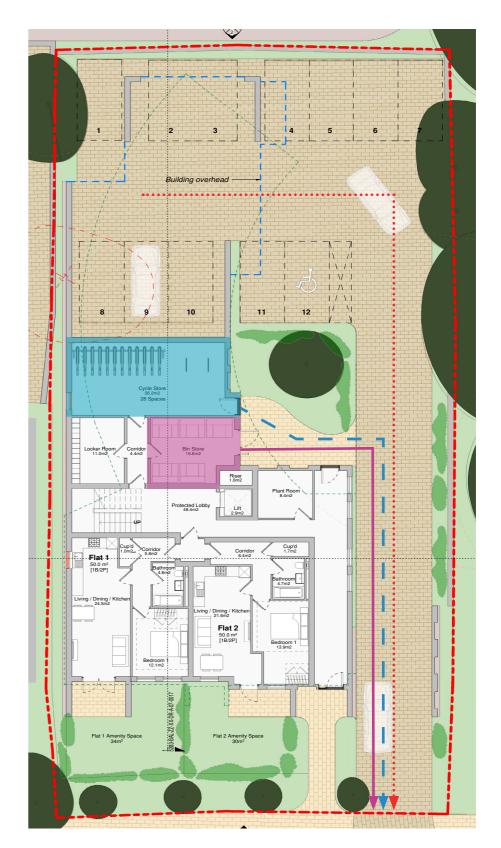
Proposed parking, bicycle store and waste storage layout
